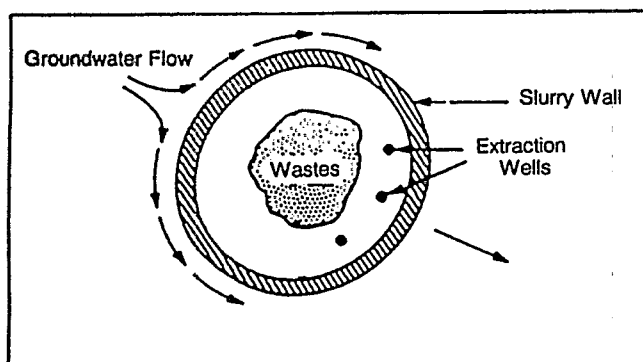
Plan of circumferential wall placement (Spooner et al., 1984).
